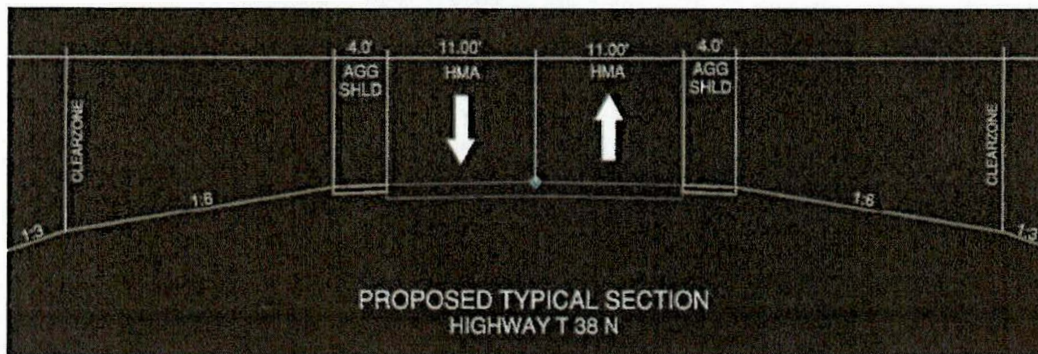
PROPOSED HIGHWAY T 38 N TYPICAL SECTION
